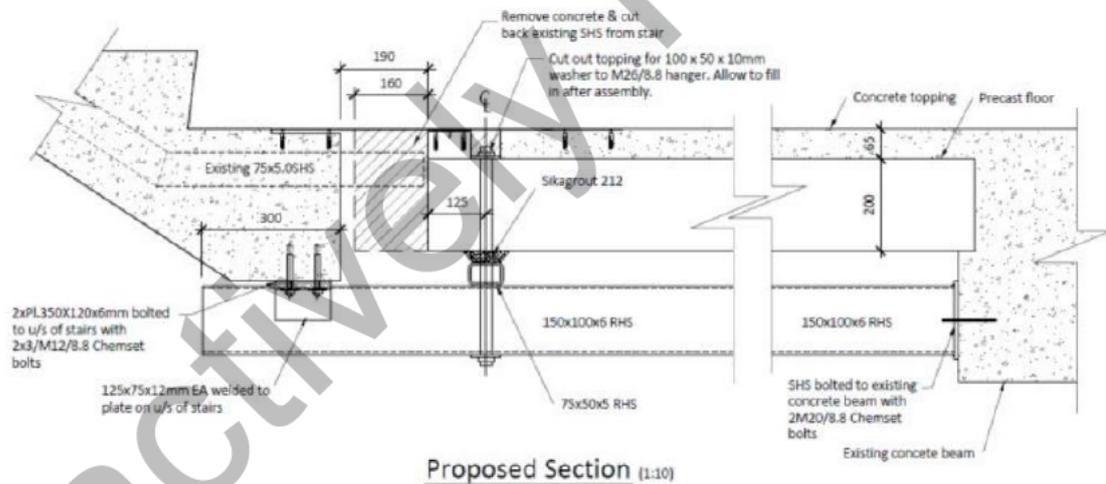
Typical Retrofit Section of the Original Stairs
